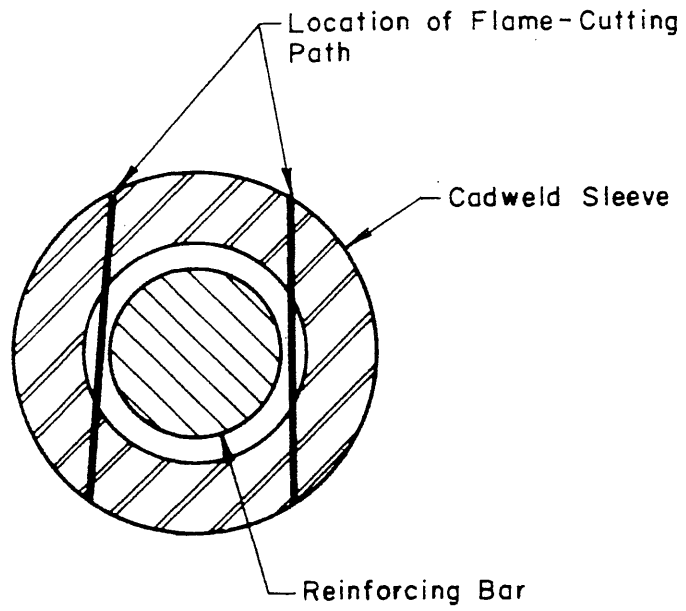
LOCATIONS OF FLAME-CUTS MADE TO REMOVE CADWELD SPLICE SLEEVE
